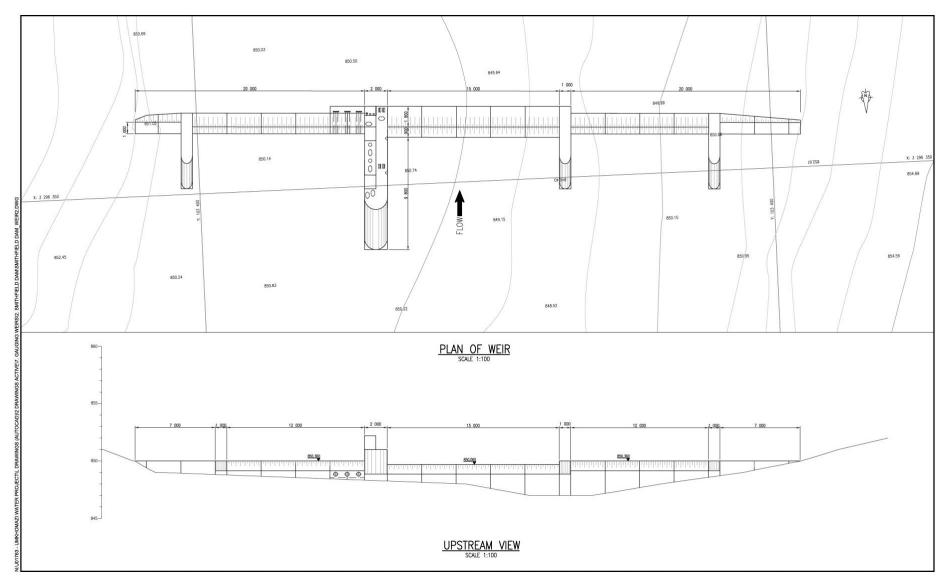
Plan and cross-sectional view of gauging weir downstream of Smithfield Dam
